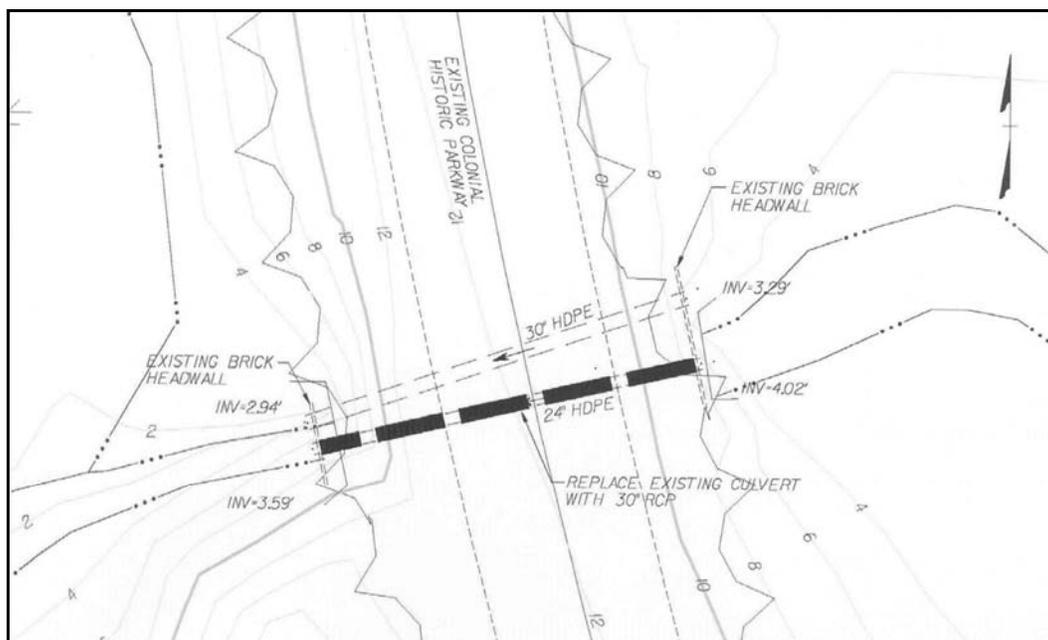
Concept Plan of Alternative 2 at Site A (Replace Existing 24-inch Culvert with 30-inch RCP); Source: NPS, 2005
